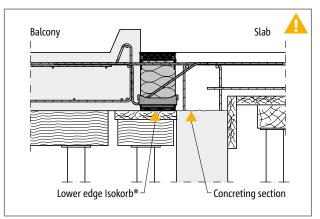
Schöck Isokorb® XT type K: In-situ concrete balcony with height offset floor on masonry wall
